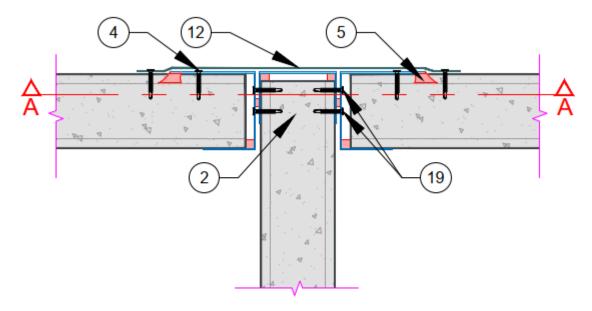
Dual void box riser – mid-wall connection when span is 6 m (metal flashing on unexposed side)
